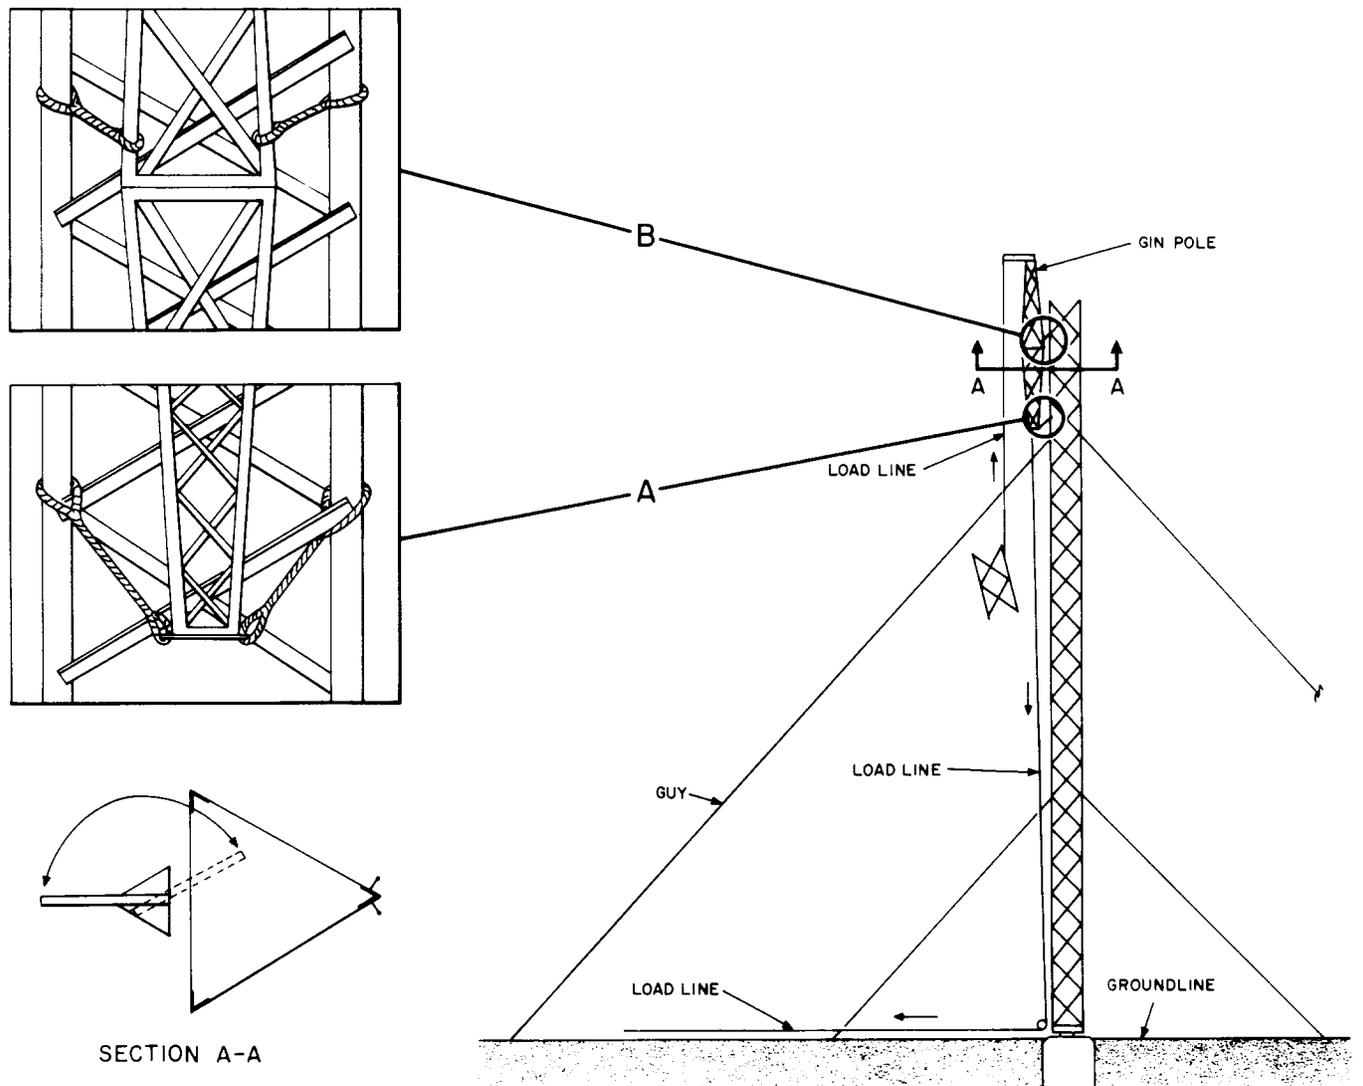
Typical Gin Pole Setup for Hoisting Tower Sections
